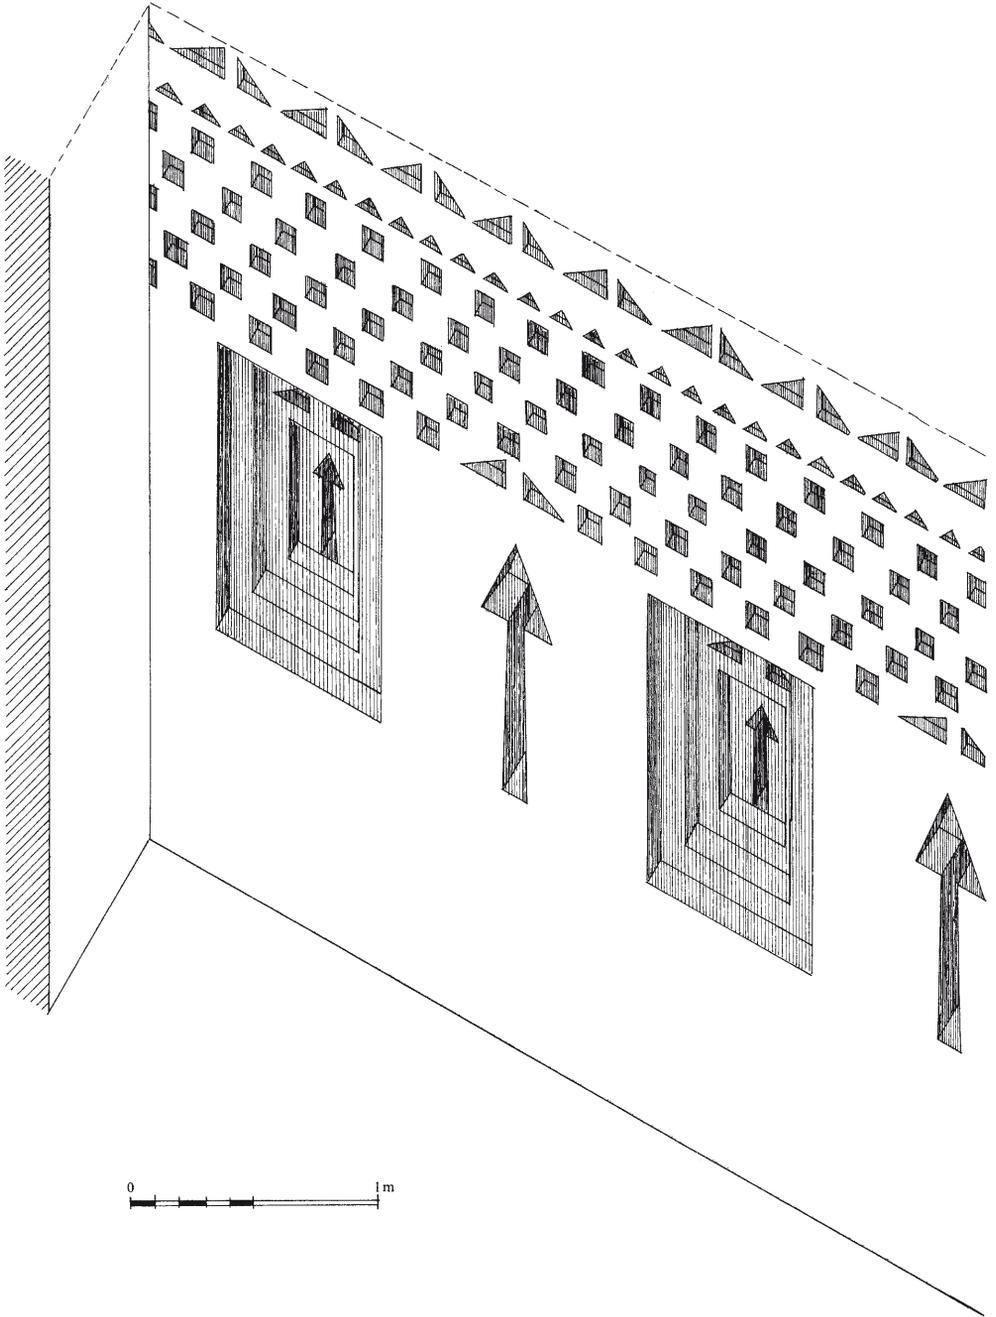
Surkh Kotal, Afghanistan, elevation of the décor of the interior enclosure wall.
